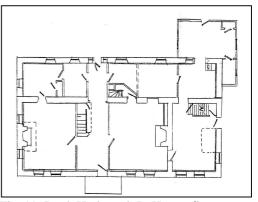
Jacob Hasbrouck Jr. House, floor plan. Sketch plan by Neil Larson, 1999.
